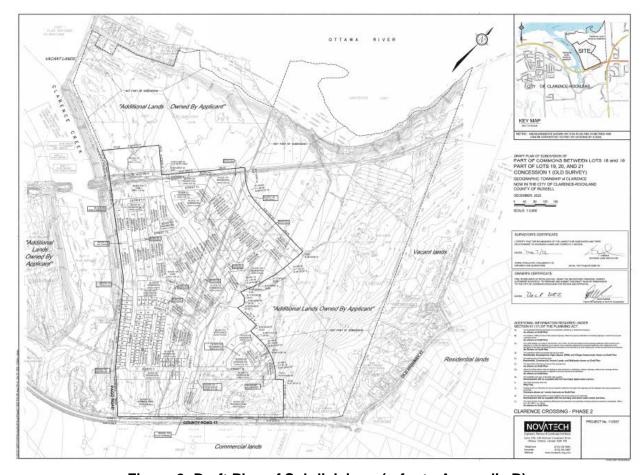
Draft Plan of Subdivision - (refer to Appendix B)
